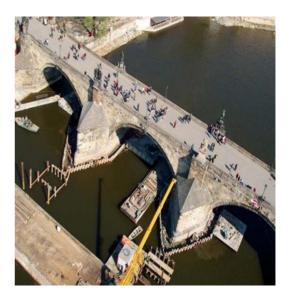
Prague - Charles bridge - failed piers in 1890 and the reconstruction of last two piers after 2002 floods.
